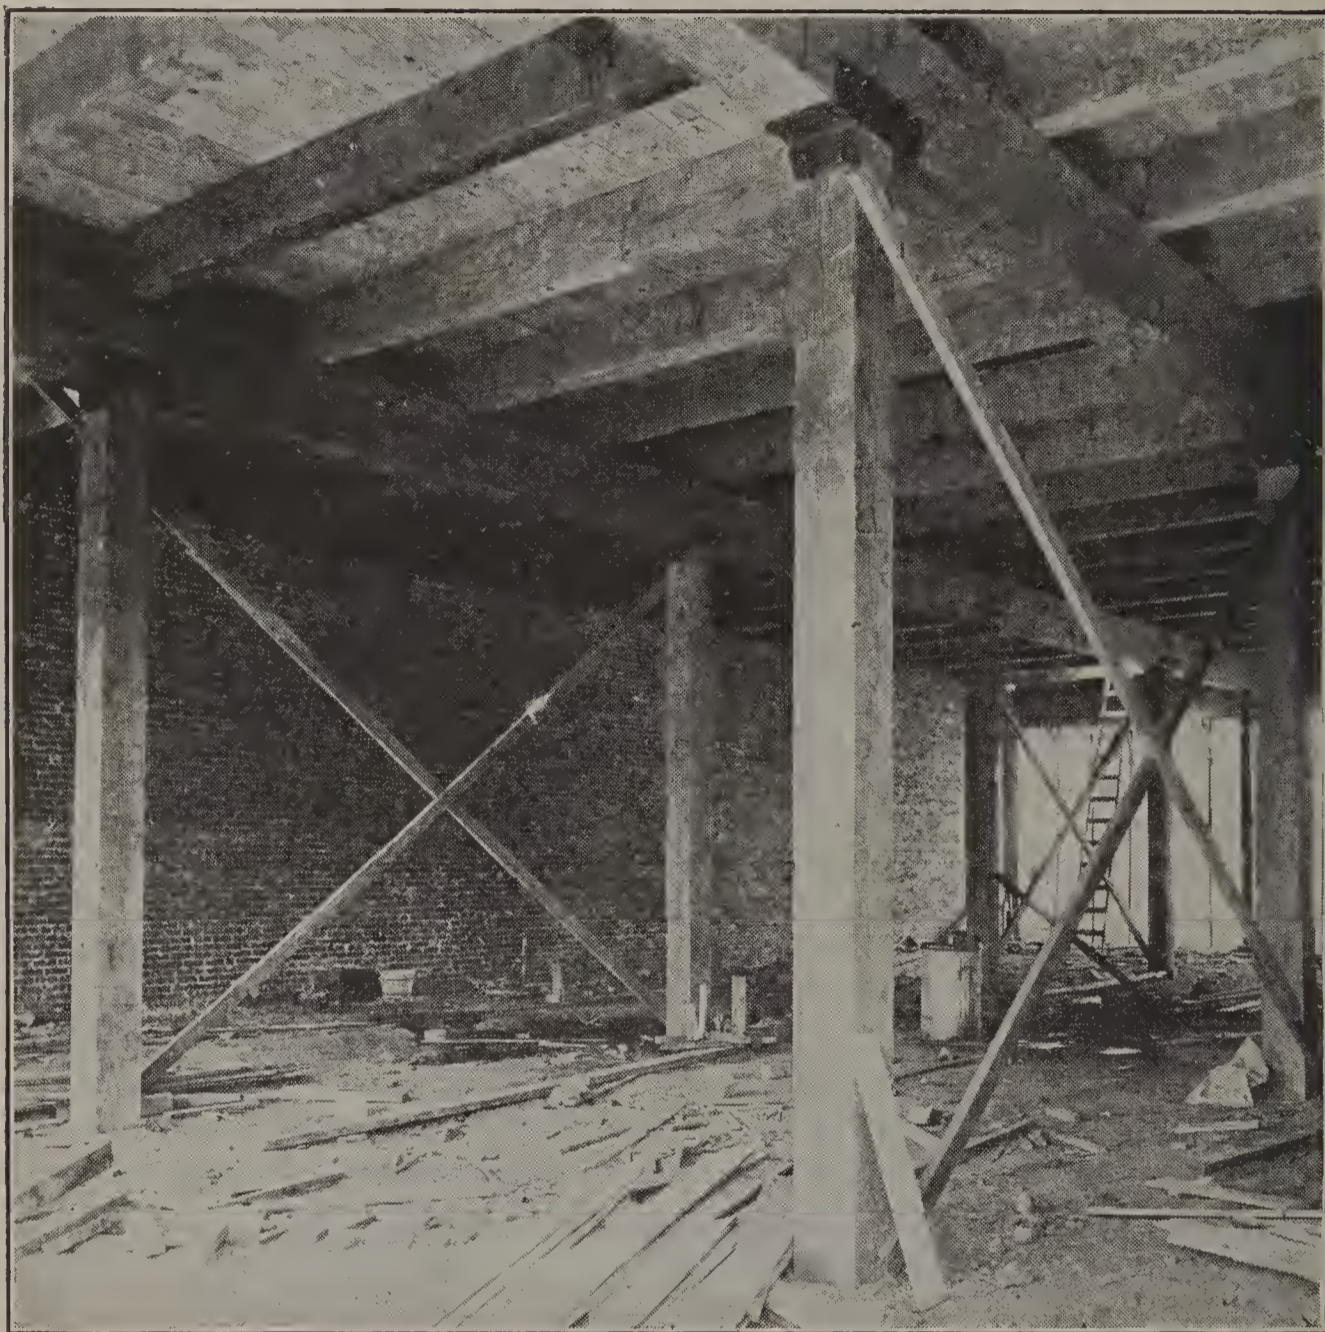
Beam-and-girder type of heavy-timber construction.
